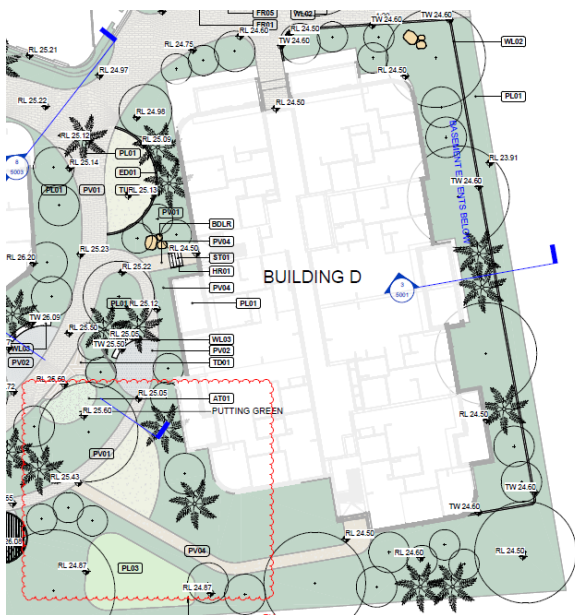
Building D landscape plan (as proposed in previous amendment report)
